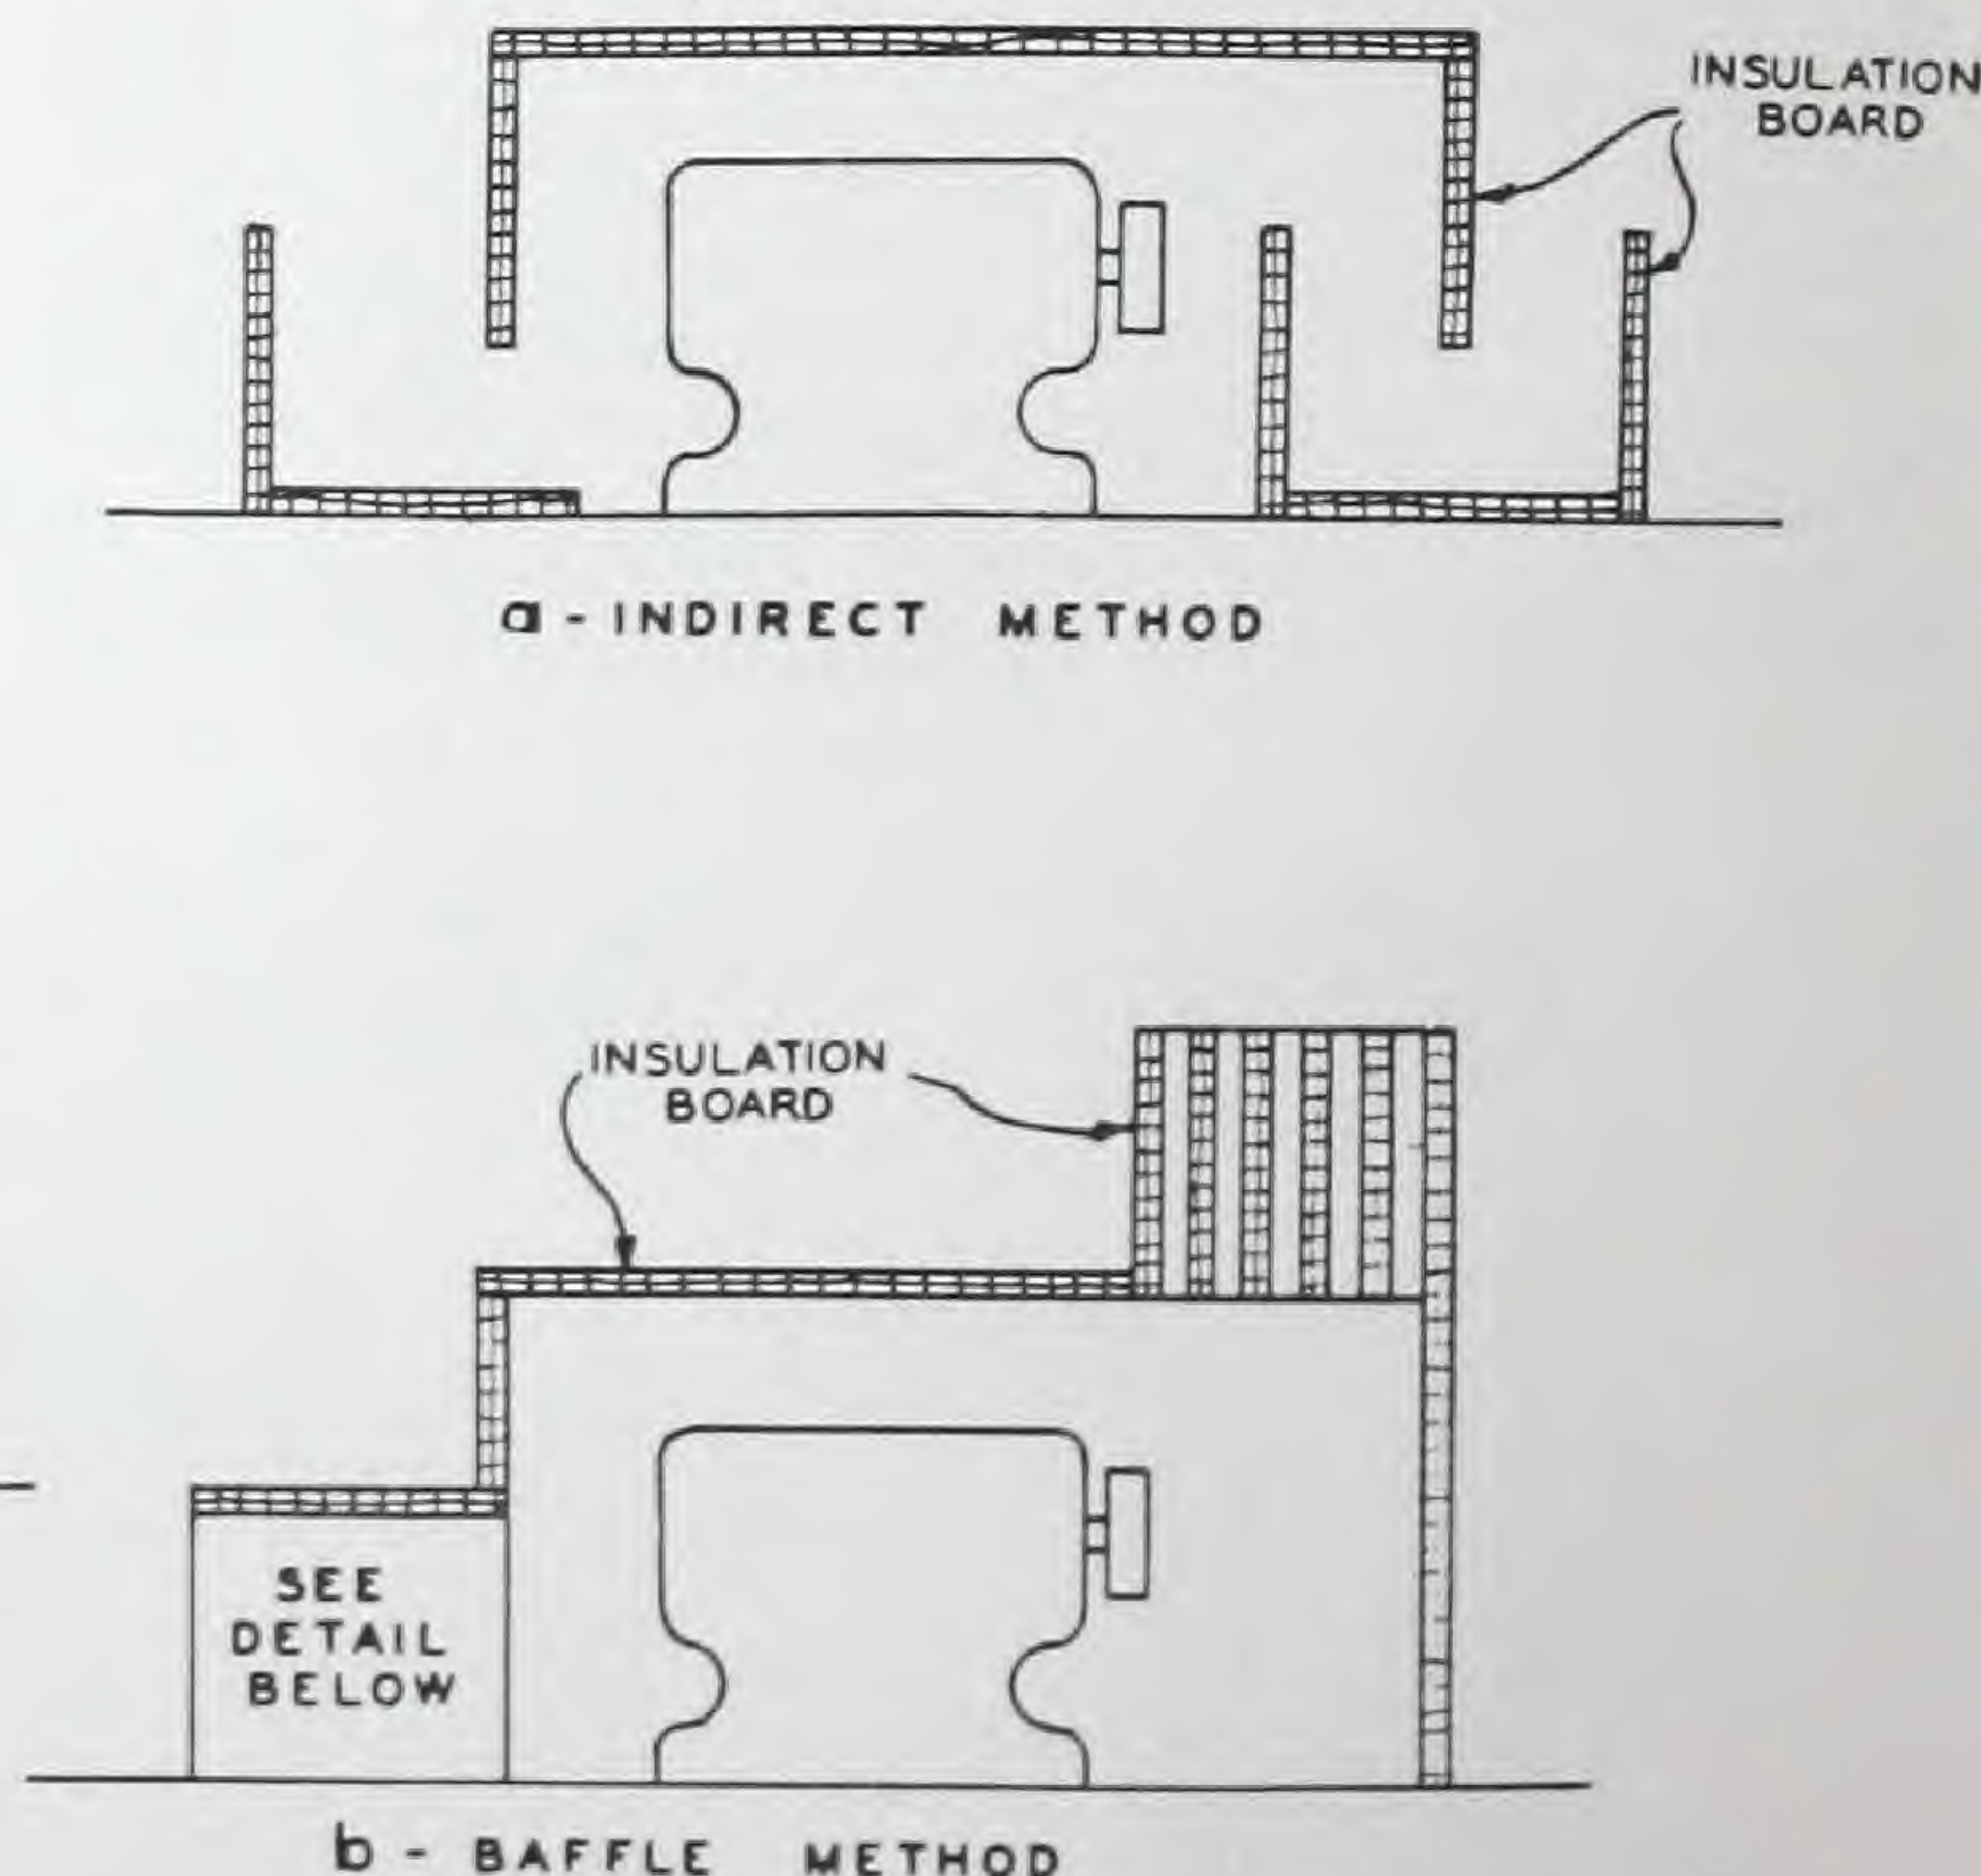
Methods of constructing insulation board hoods for motors and machines.
